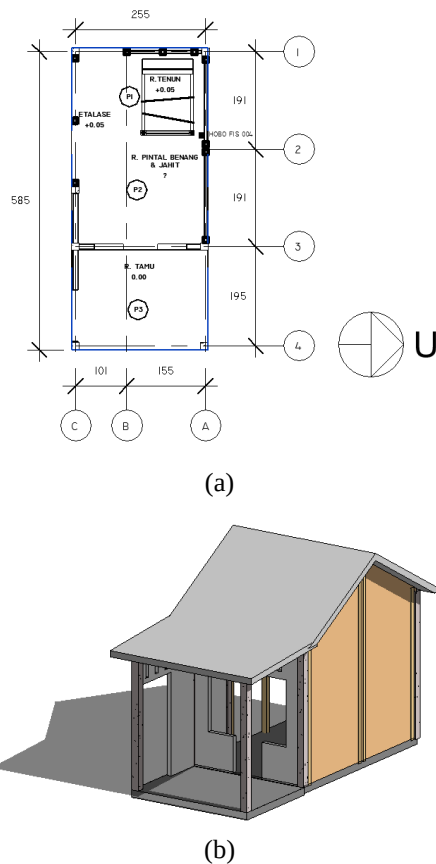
Belida Bayan (a) Floor Plan, (b) 3D Building Visualization
